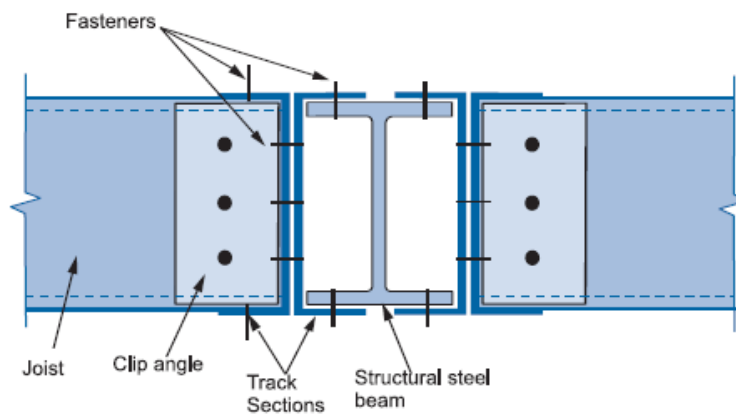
Flush-in-Floor Joists with Steel Beam [40]
